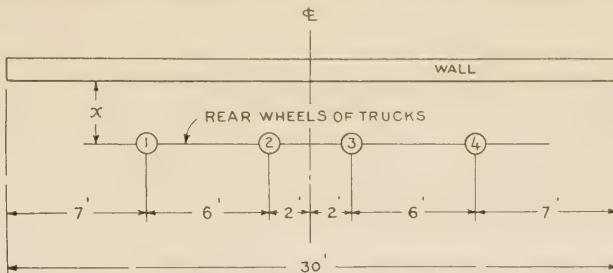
PLAN OF ABUTMENT WALL, SHOWING POSITION OF REAR WHEELS OF 2 TRUCKS.
